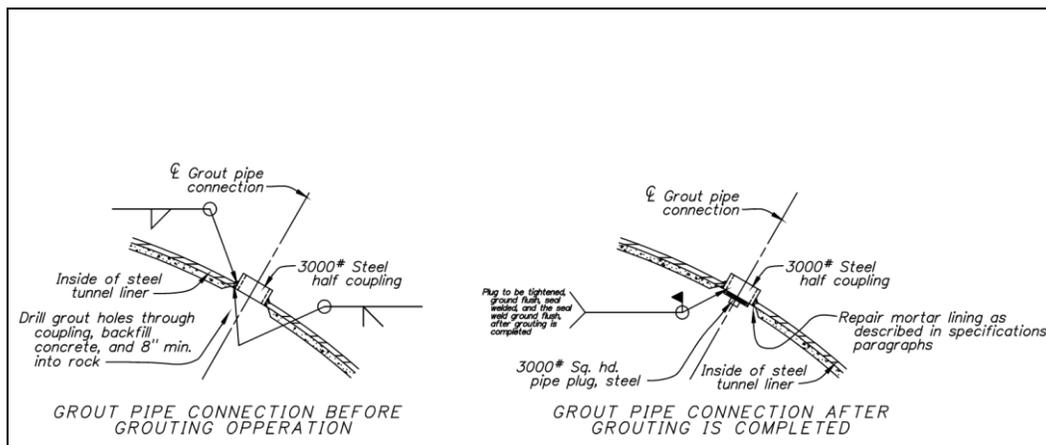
Grout pipe connection details for steel liner.
